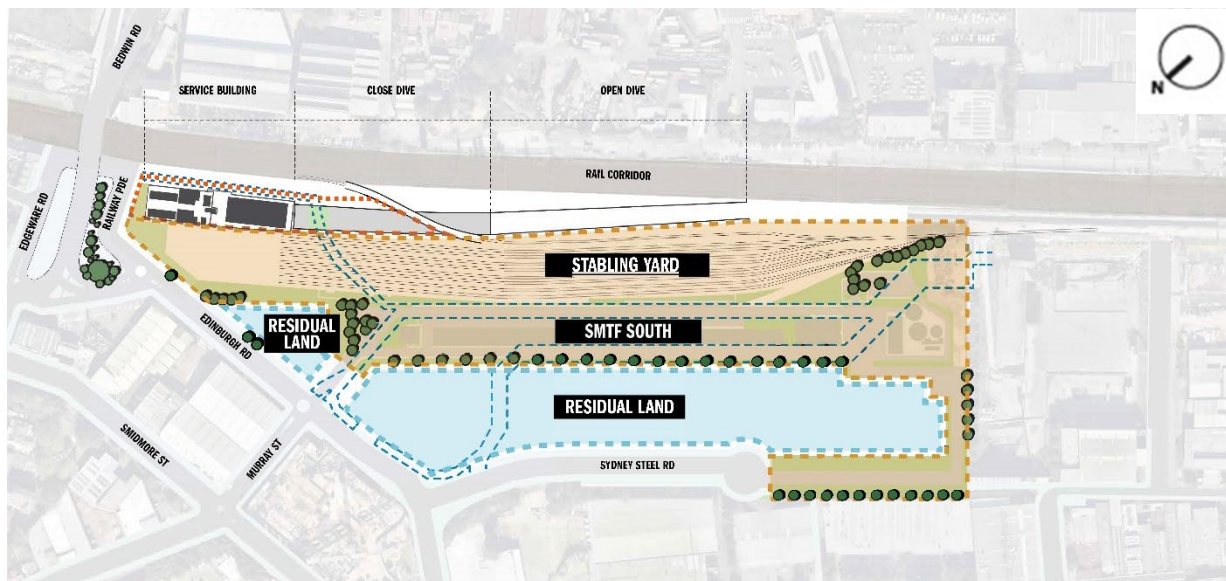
Marrickville Dive – Overall site plan showing proposed arrangement of buildings with the site
